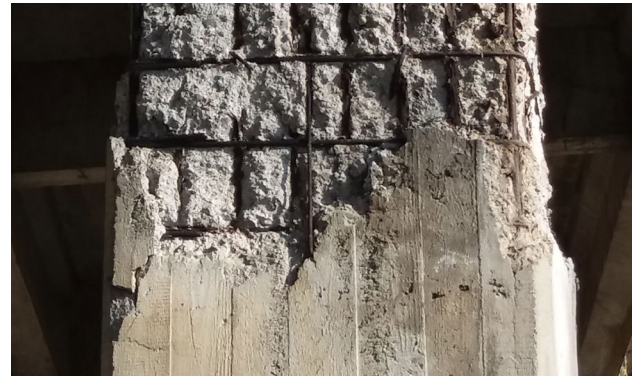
Example of concrete cover spalling of a bridge pier [4]
